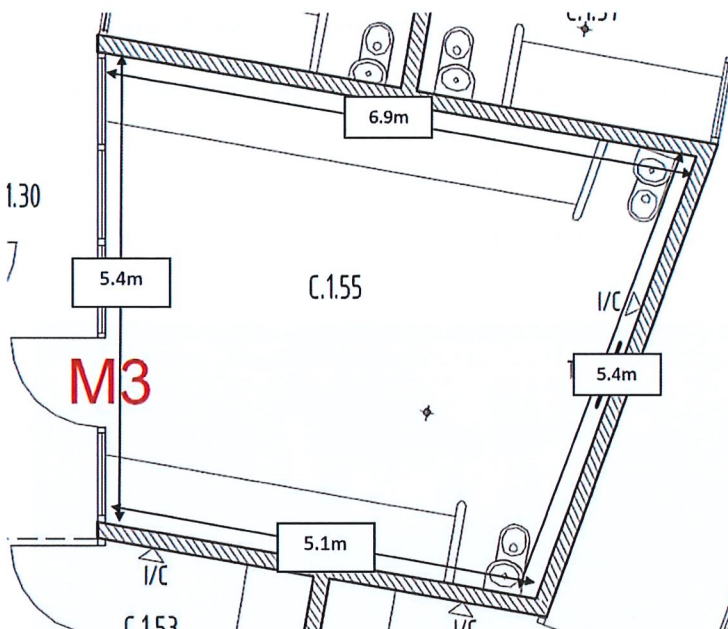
M3 Cell layout. Floor plan provided by Corrections.
